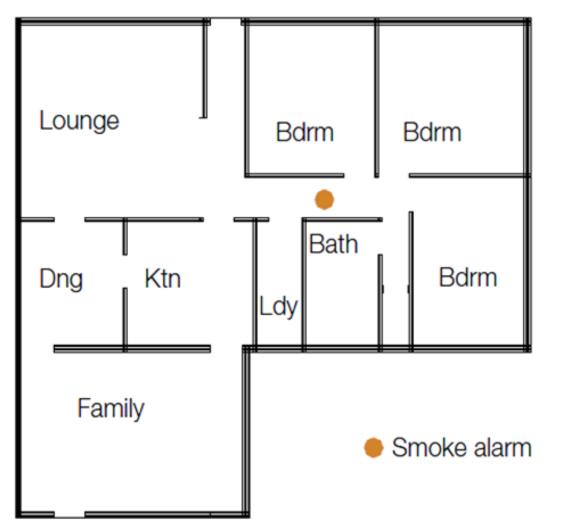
Dwellings with bedrooms grouped together
